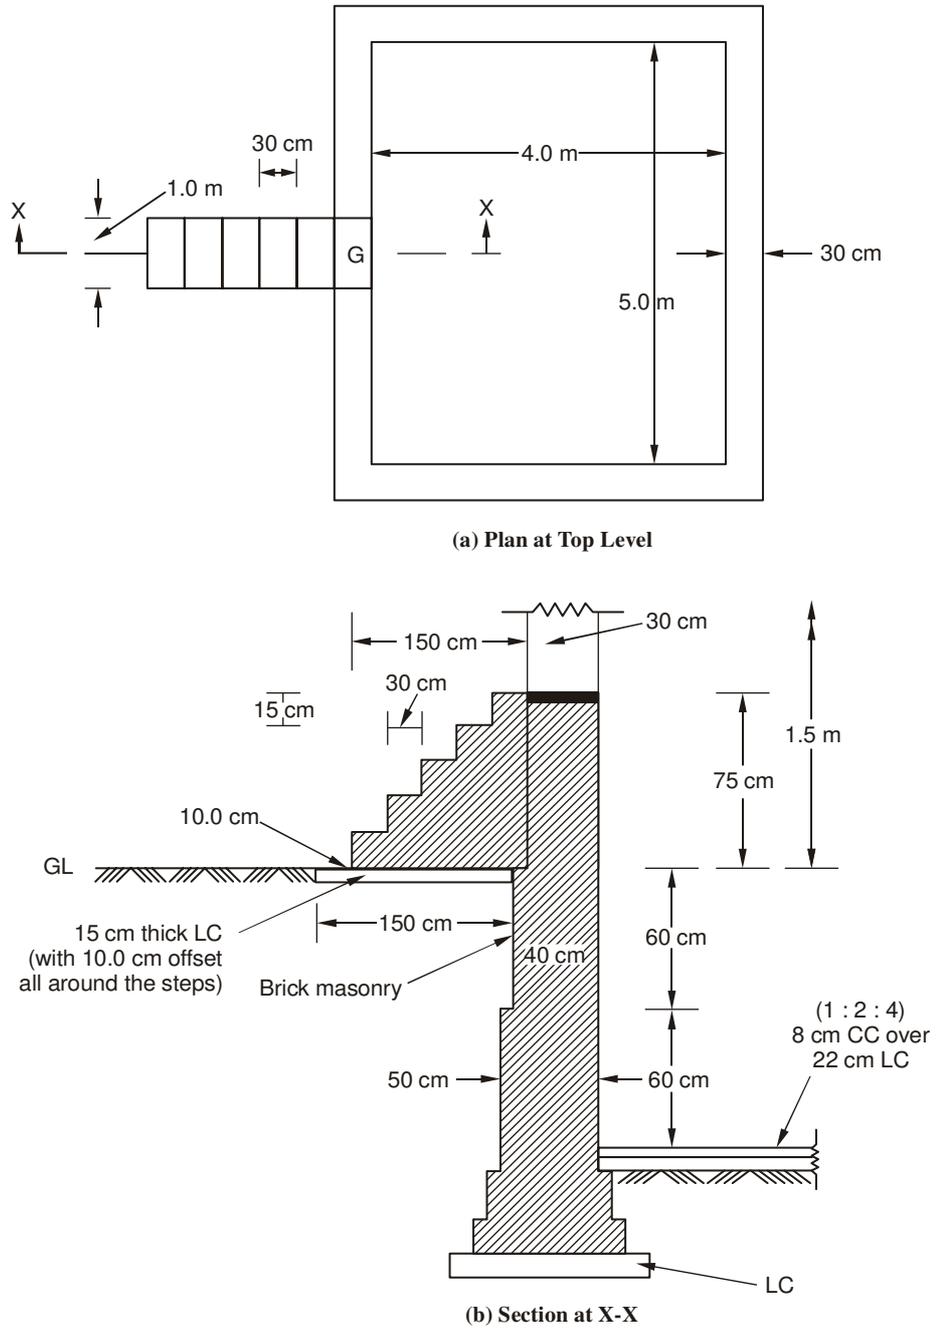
Details of an Underground Water Tank – (Not to Scale)
